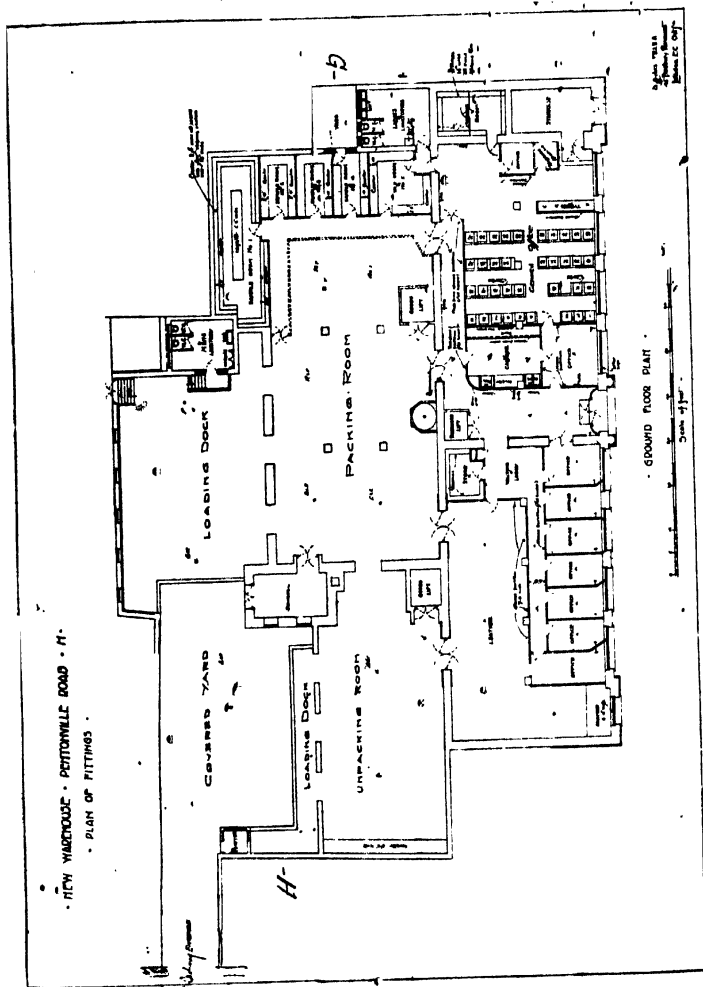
Boot warehouse, Pentonville Road, London. (A. Sykes, F.R.I.B.A., Architect.)
